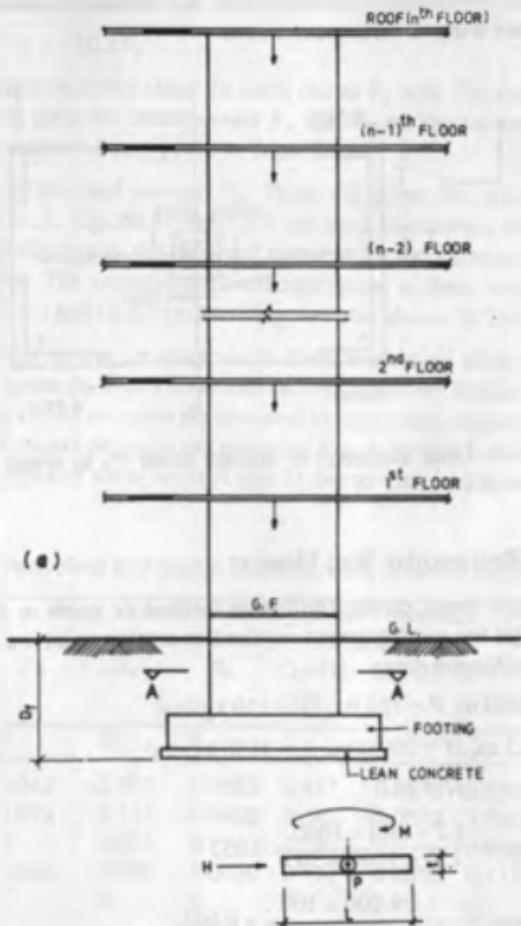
Solid rectangular shear wall. (a) Elevation of shear wall; (b) Section A-A.
